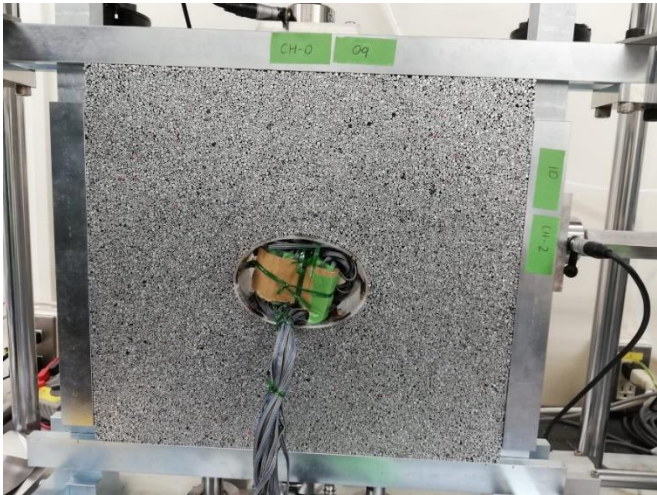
Tunnel deformation behavior under biaxial compression test
